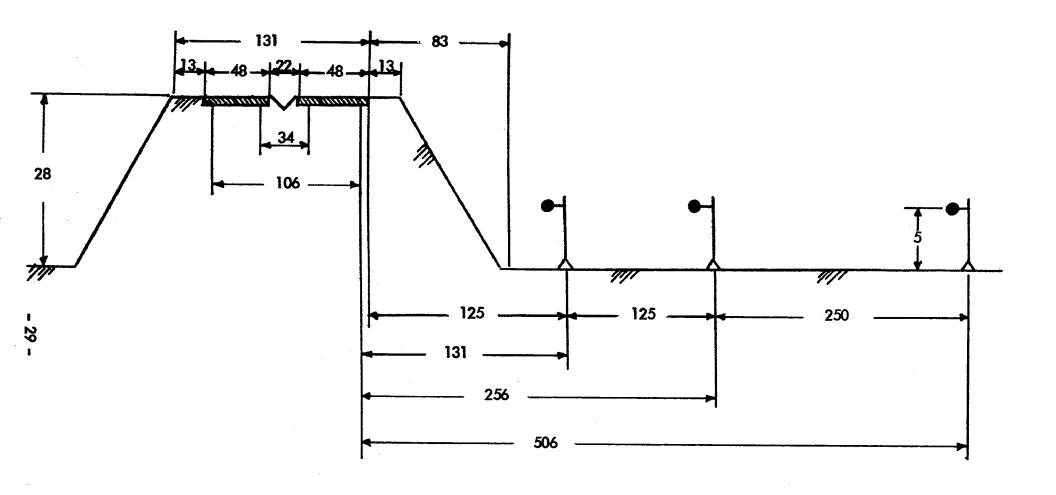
Site 11: Elevated Highway Configuration 8-Lane Freeway
